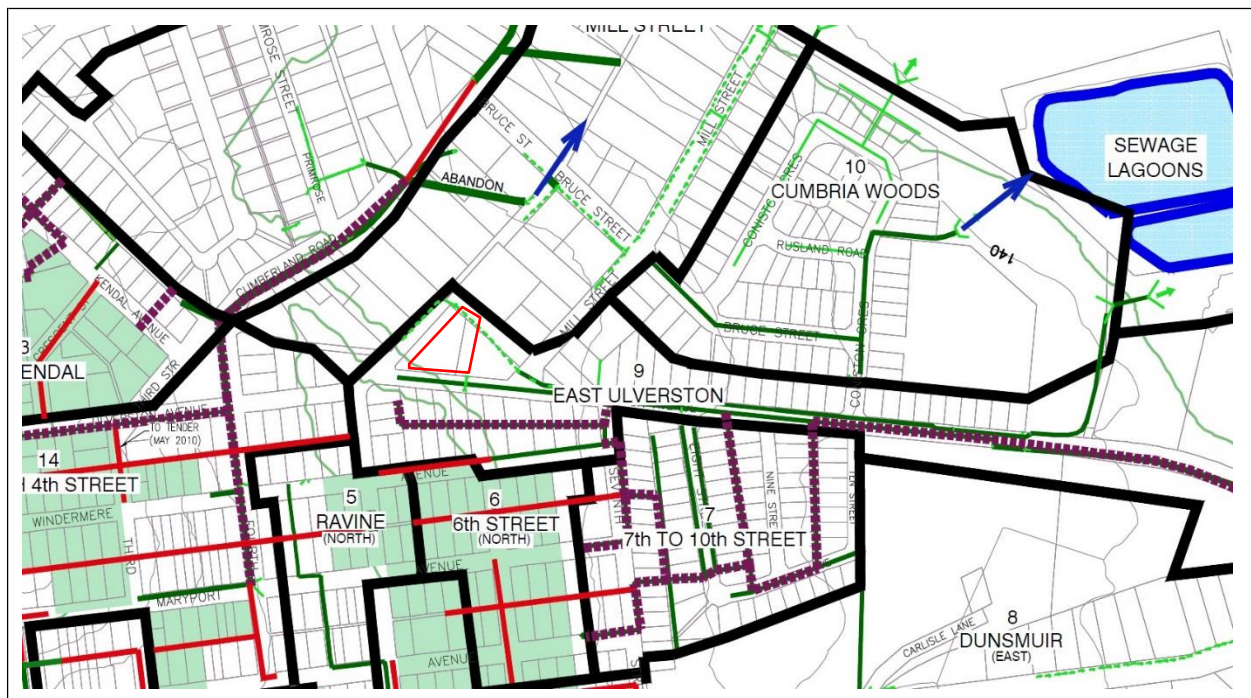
Excerpt from Stormwater Management Plan – subject parcel outlined in red.
